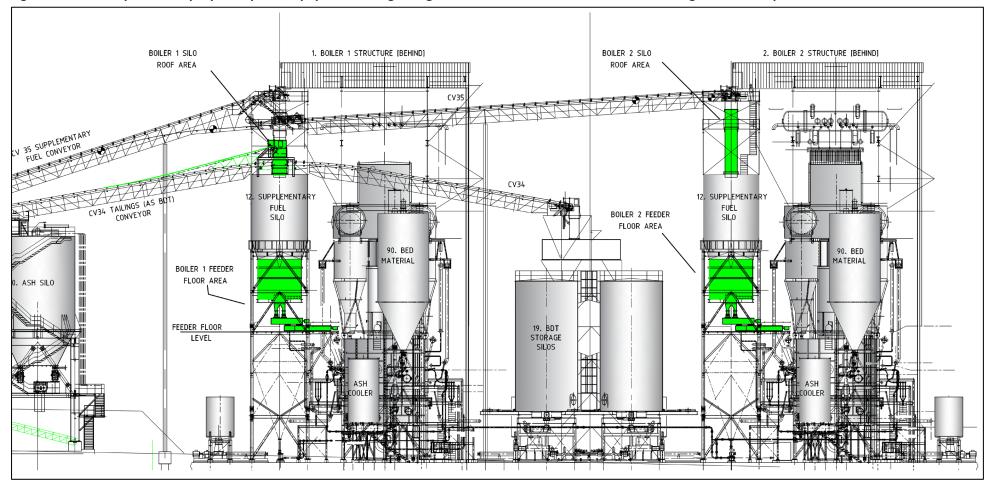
Boiler plant area proposed plant/equipment changes in green. East elevation view. Refer to 0 for high resolution plan.
